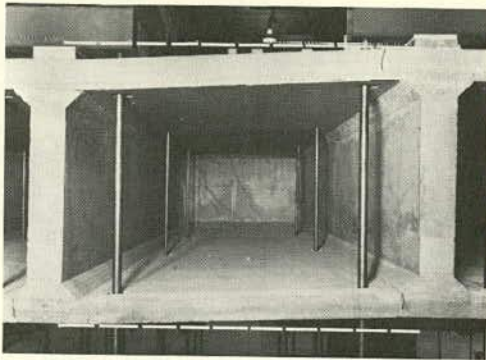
Shearing Distortion of Box Girder for Specimen SF-5
